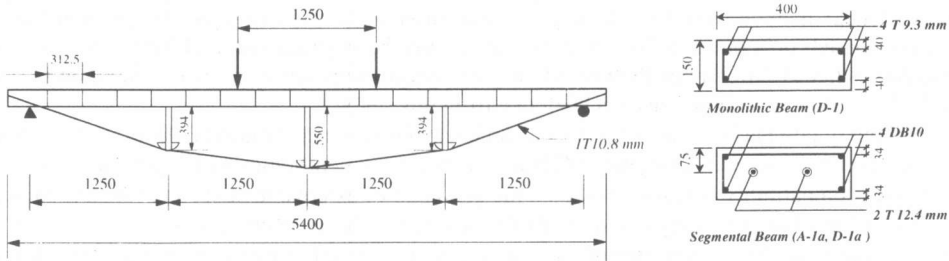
Layout of simply supported beam (D-1a) and cross section details
